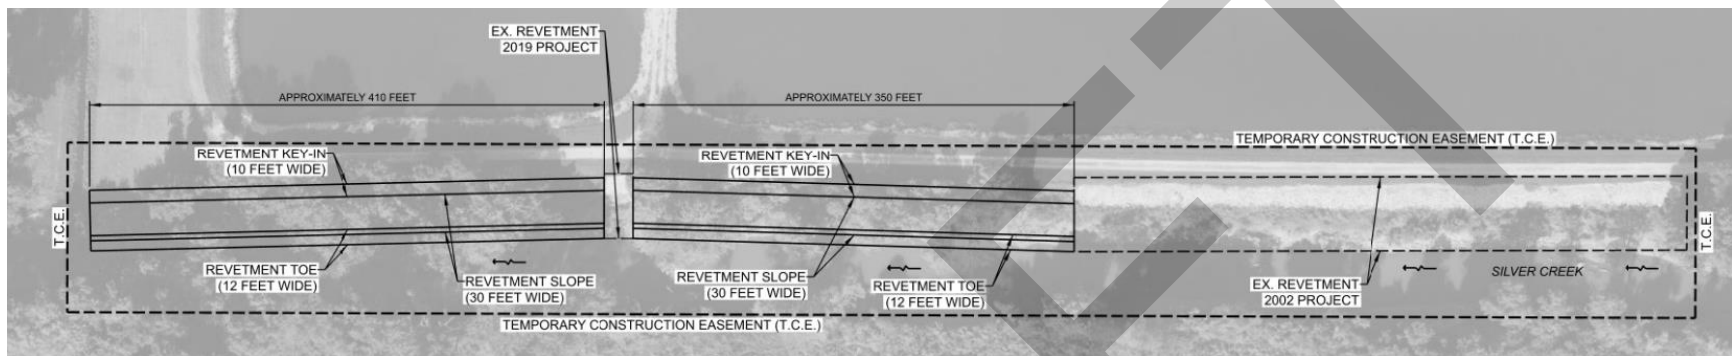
Streambank revetment plans and construction limits on Silver Creek, St. Clair County, IL.
